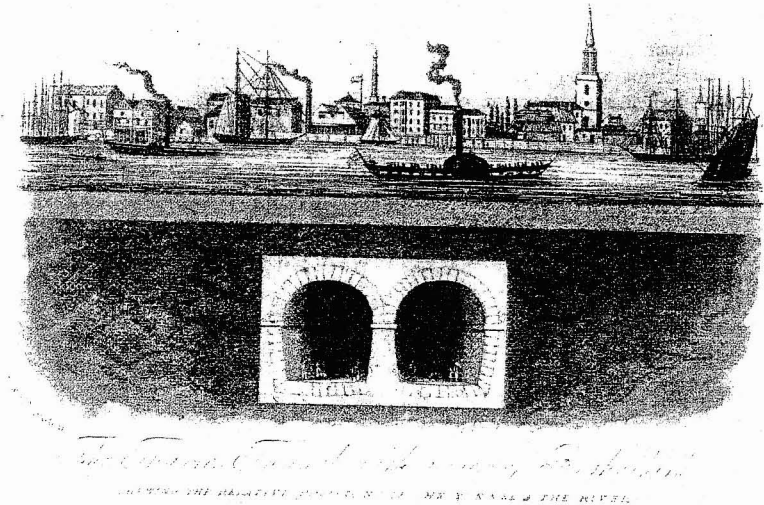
Section through the Thames Tunnel, which could not have been built without the tenacious bond and waterproofing properties of Roman cement.
